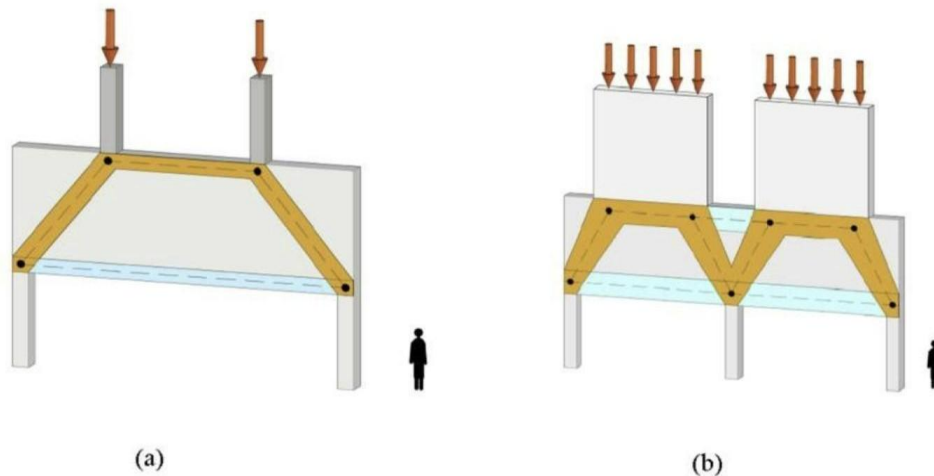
a: Application of deep beams: Transfer beam supporting columns and b: Application of deep beams: Transfer girder supporting Walls (Proestos, Palipana, Mihaylov 2021)
